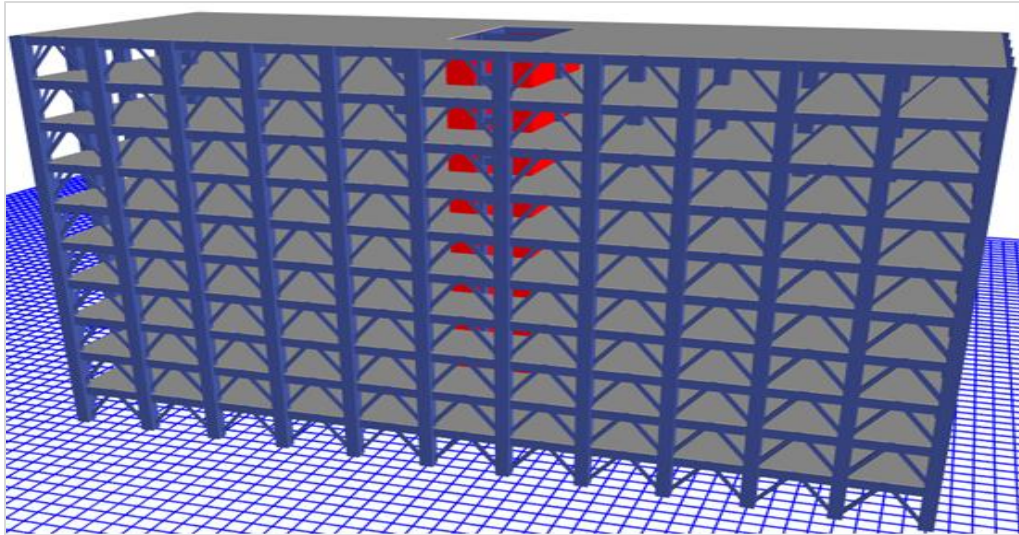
3D View of structural skeleton of framed tube structure with Inverted V bracings
